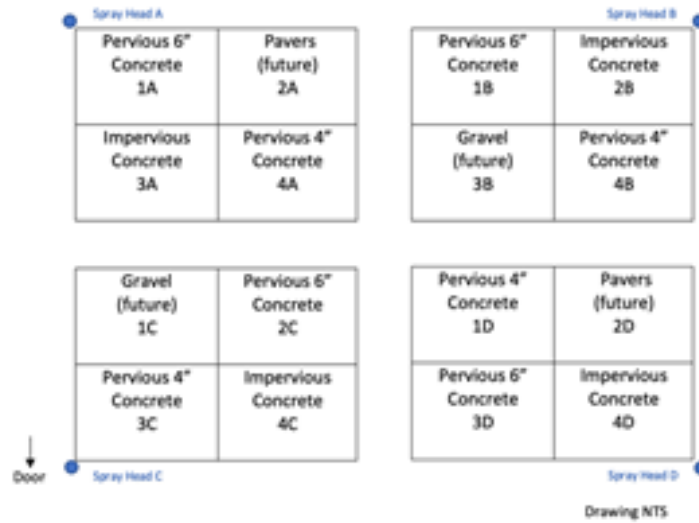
Plan View of Green Infrastructure Lab pavement test layout. Note: gravel and paver test cells (2A, 3B, 1C, and 2D) are reserved for future study and were not included in this research study.
